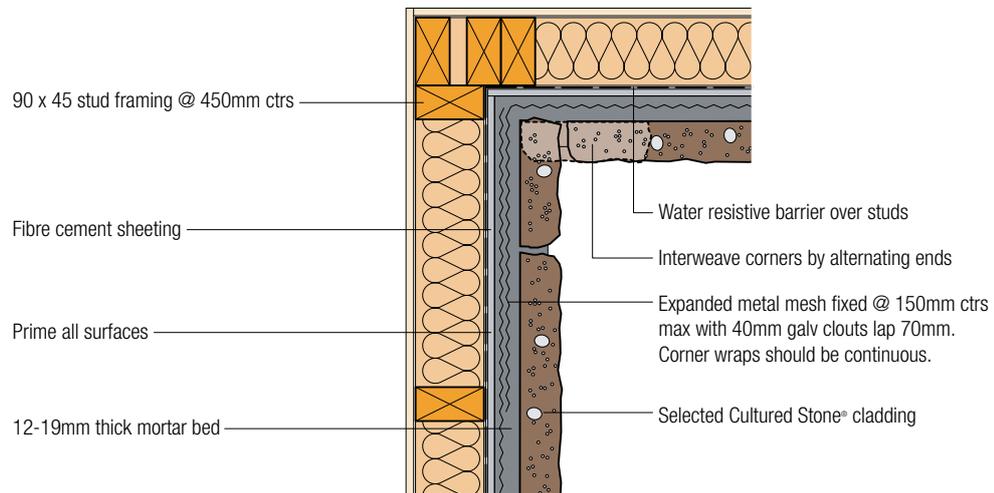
Fibre Cement Clad Typical Internal Corner - Plan (Dwg # CS-02.02)
